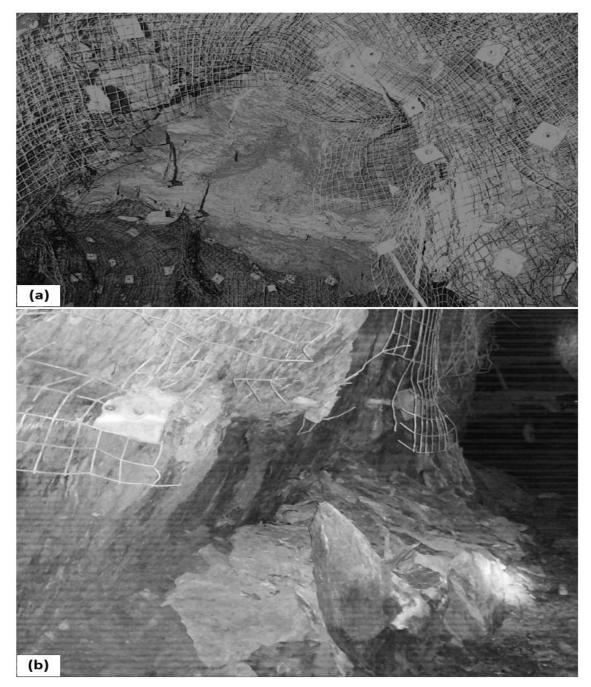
Structural failures: (a) ground fall, (b) sidewall fall
